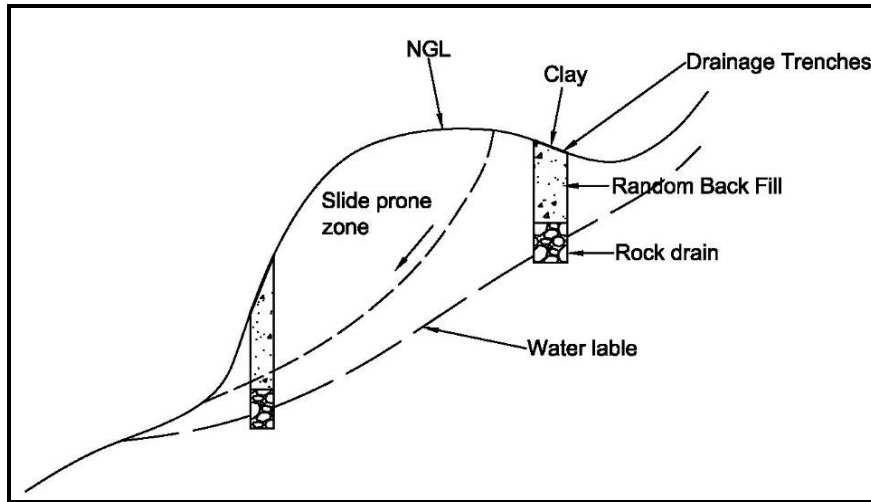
Arrangement of Lowering Water Table in Slide Prone Zone
